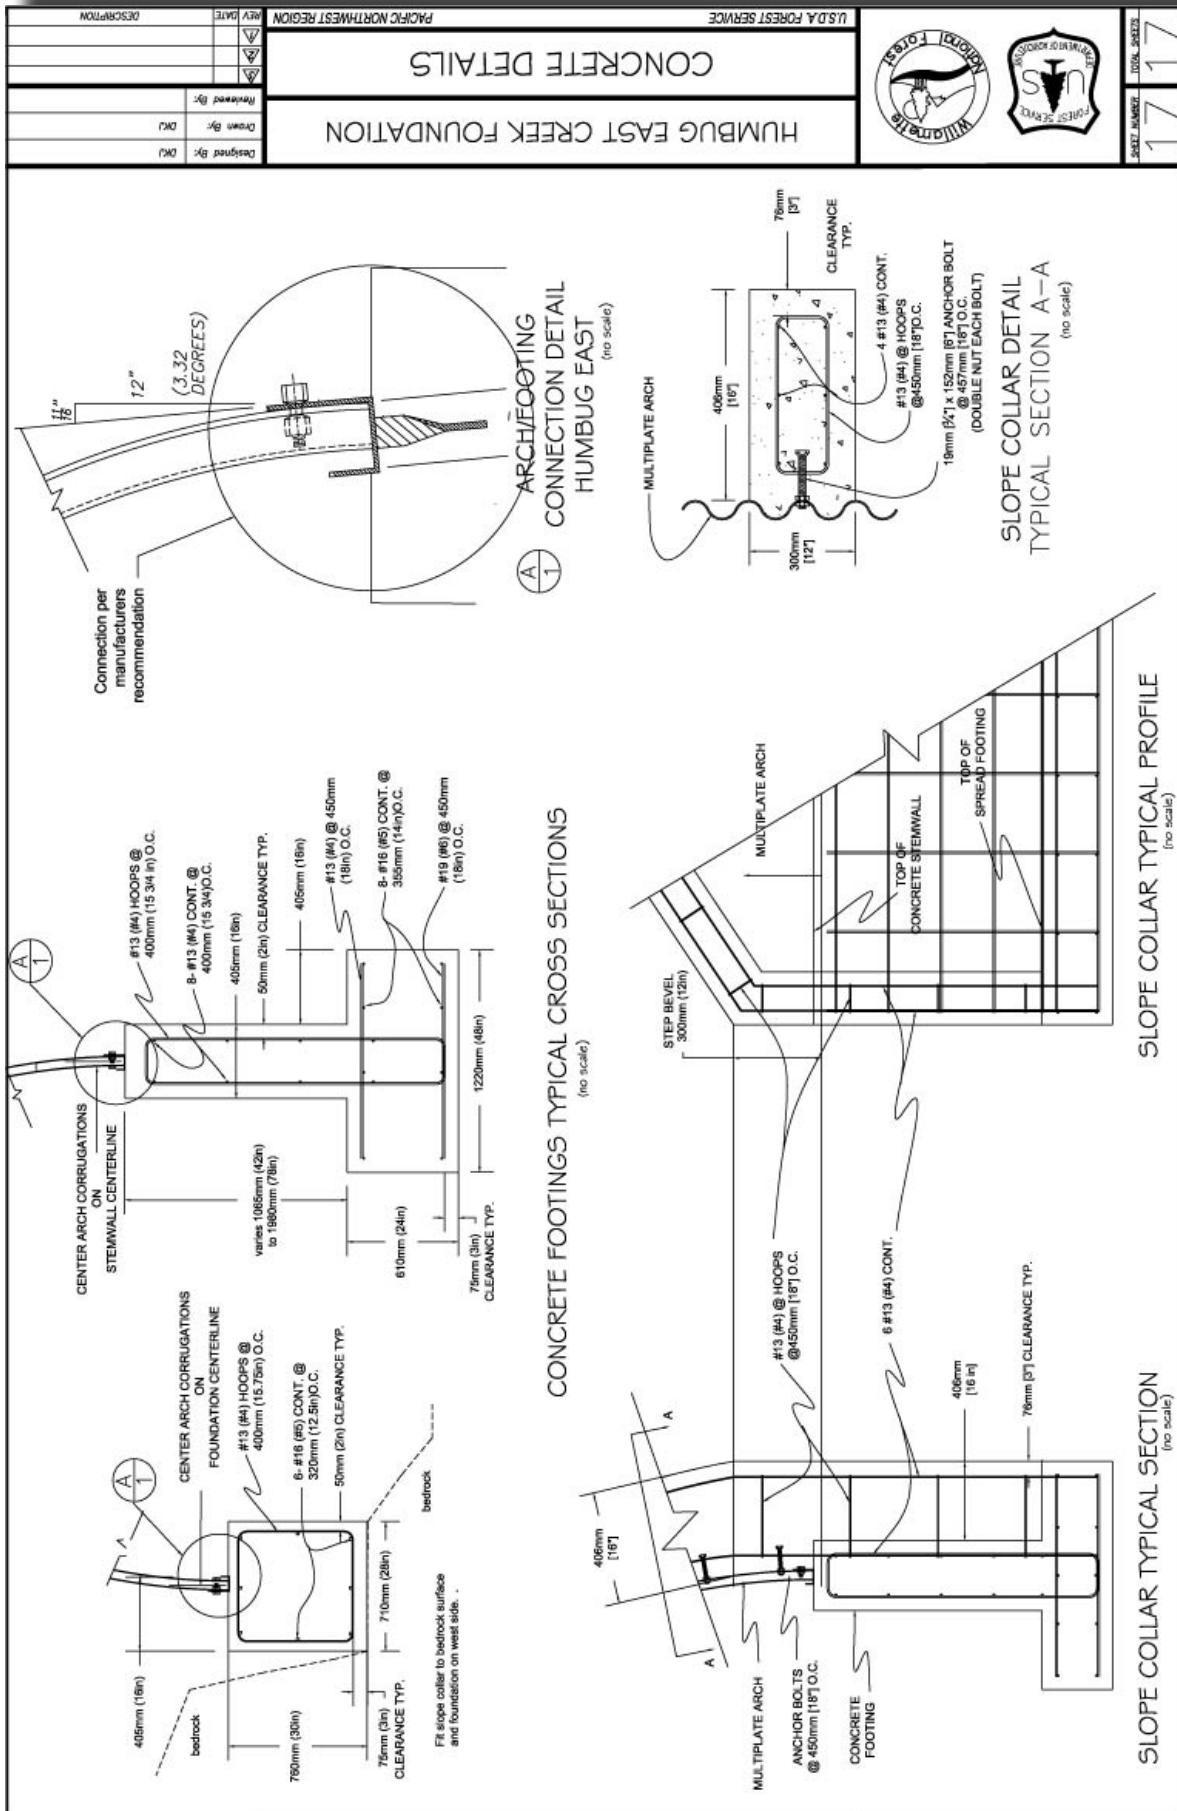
Humbug Sheet 17 - Foundation Details.
